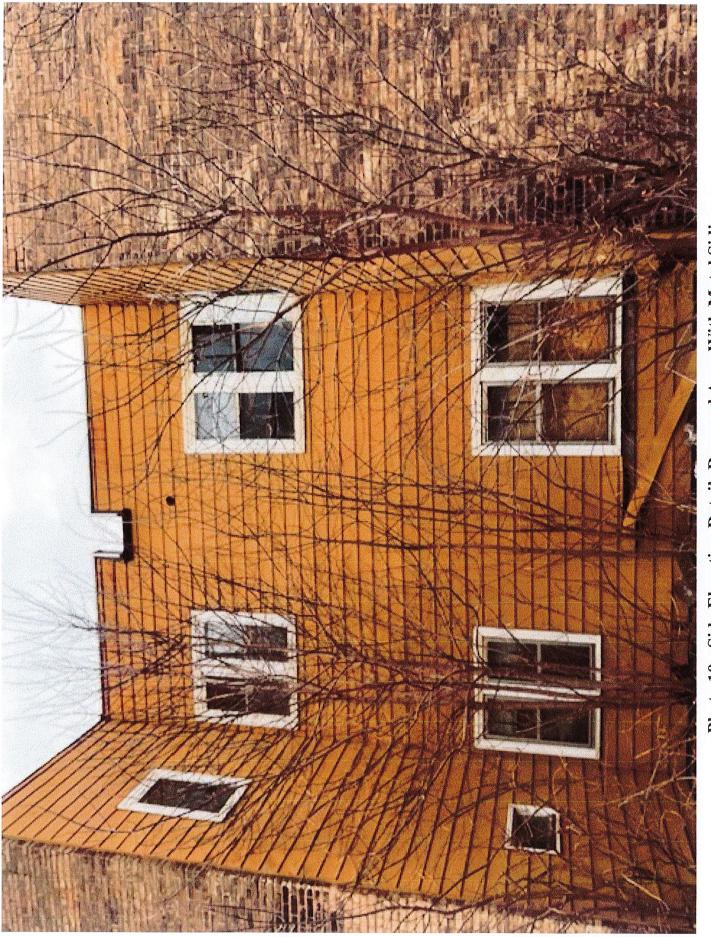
Side Elevation Detail: Recessed Area With Metal Siding
